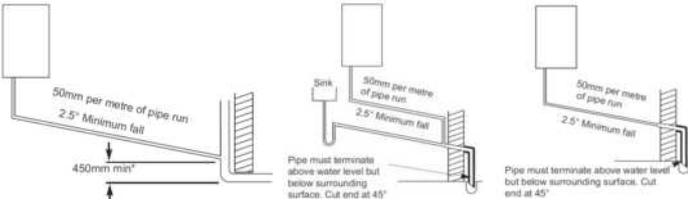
Connection to an internal soil-vent pipe, external termination with sink, to drain or gully
